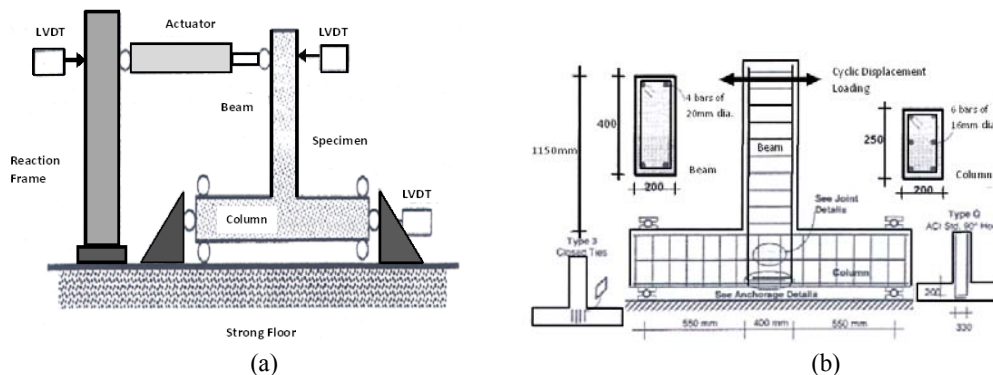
(a) Test setup, (b) Layout of the specimen reinforcement [5]
